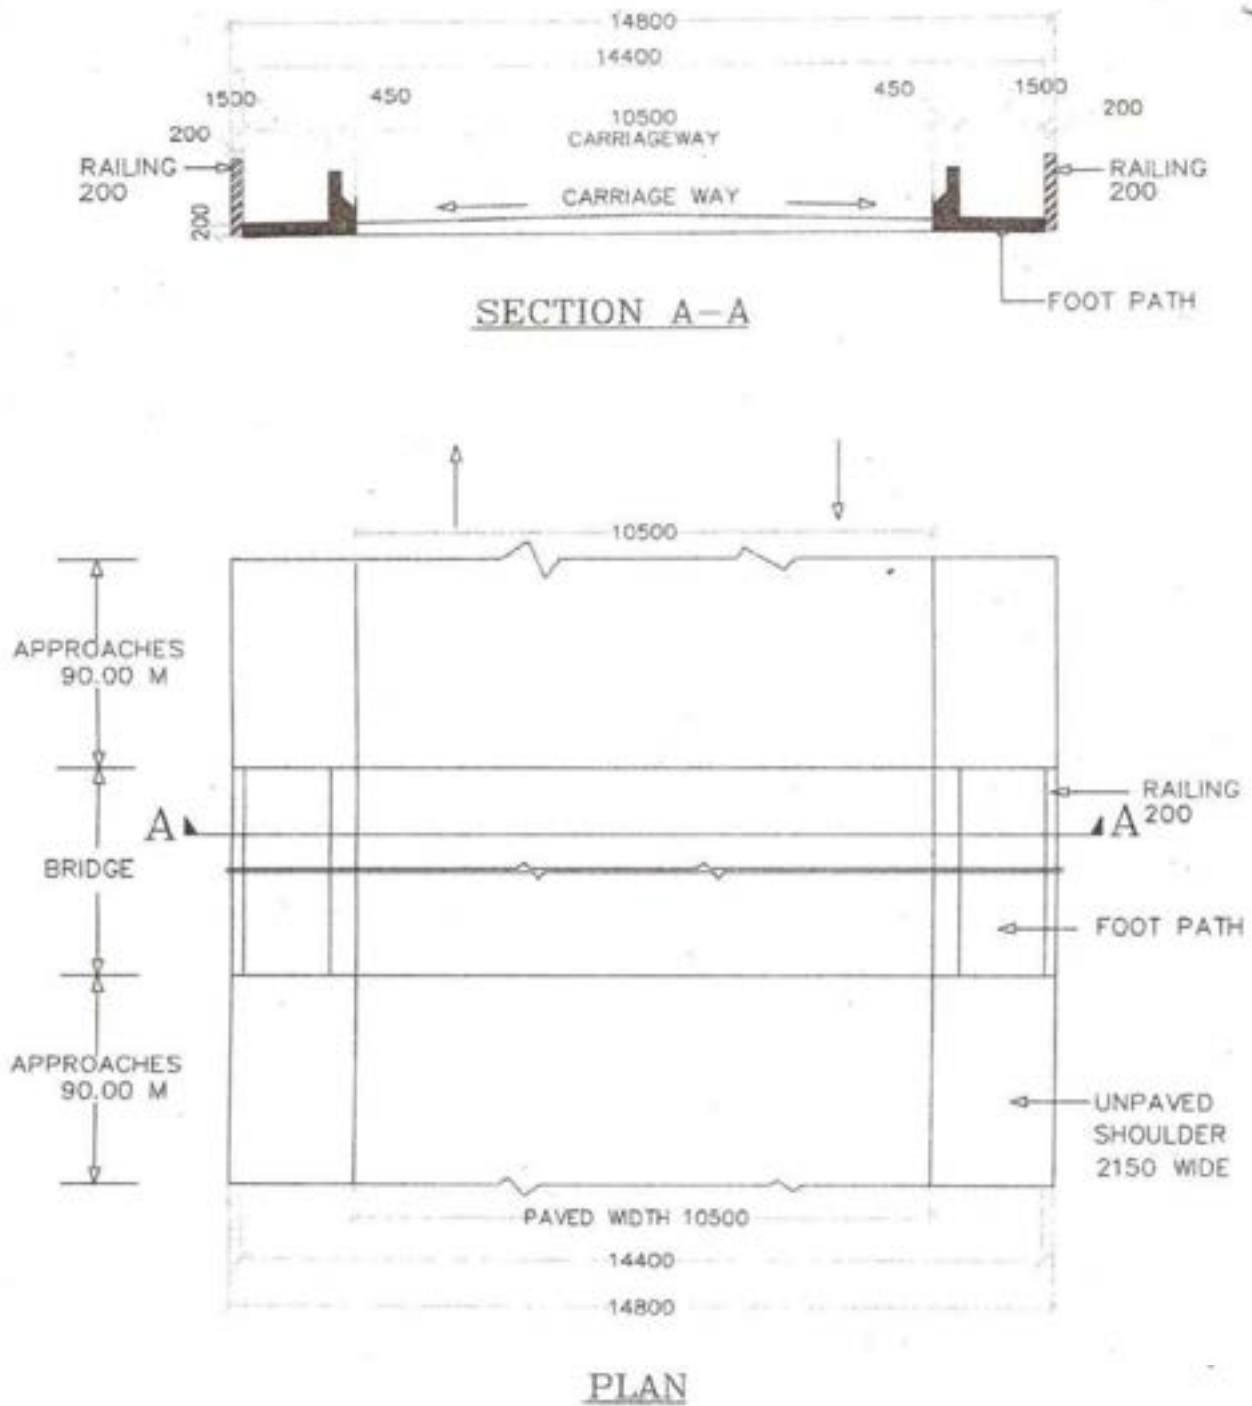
TWO LANE HIGHWAY BRIDGE WITH FOOTPATHS HAVING CRASH BARRIER BETWEEN FOOTPATH AND CARRIAGEWAY
